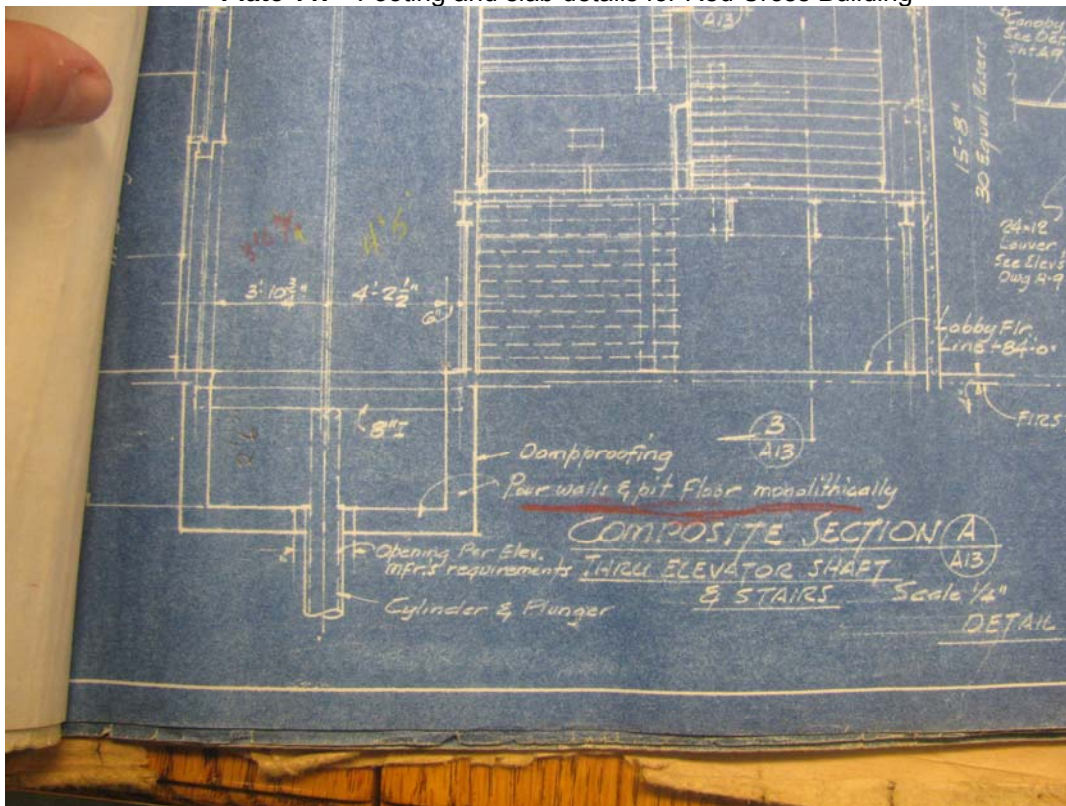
Elevator shaft subsurface details (showing distance of 2'6" to the bottom of pit)
